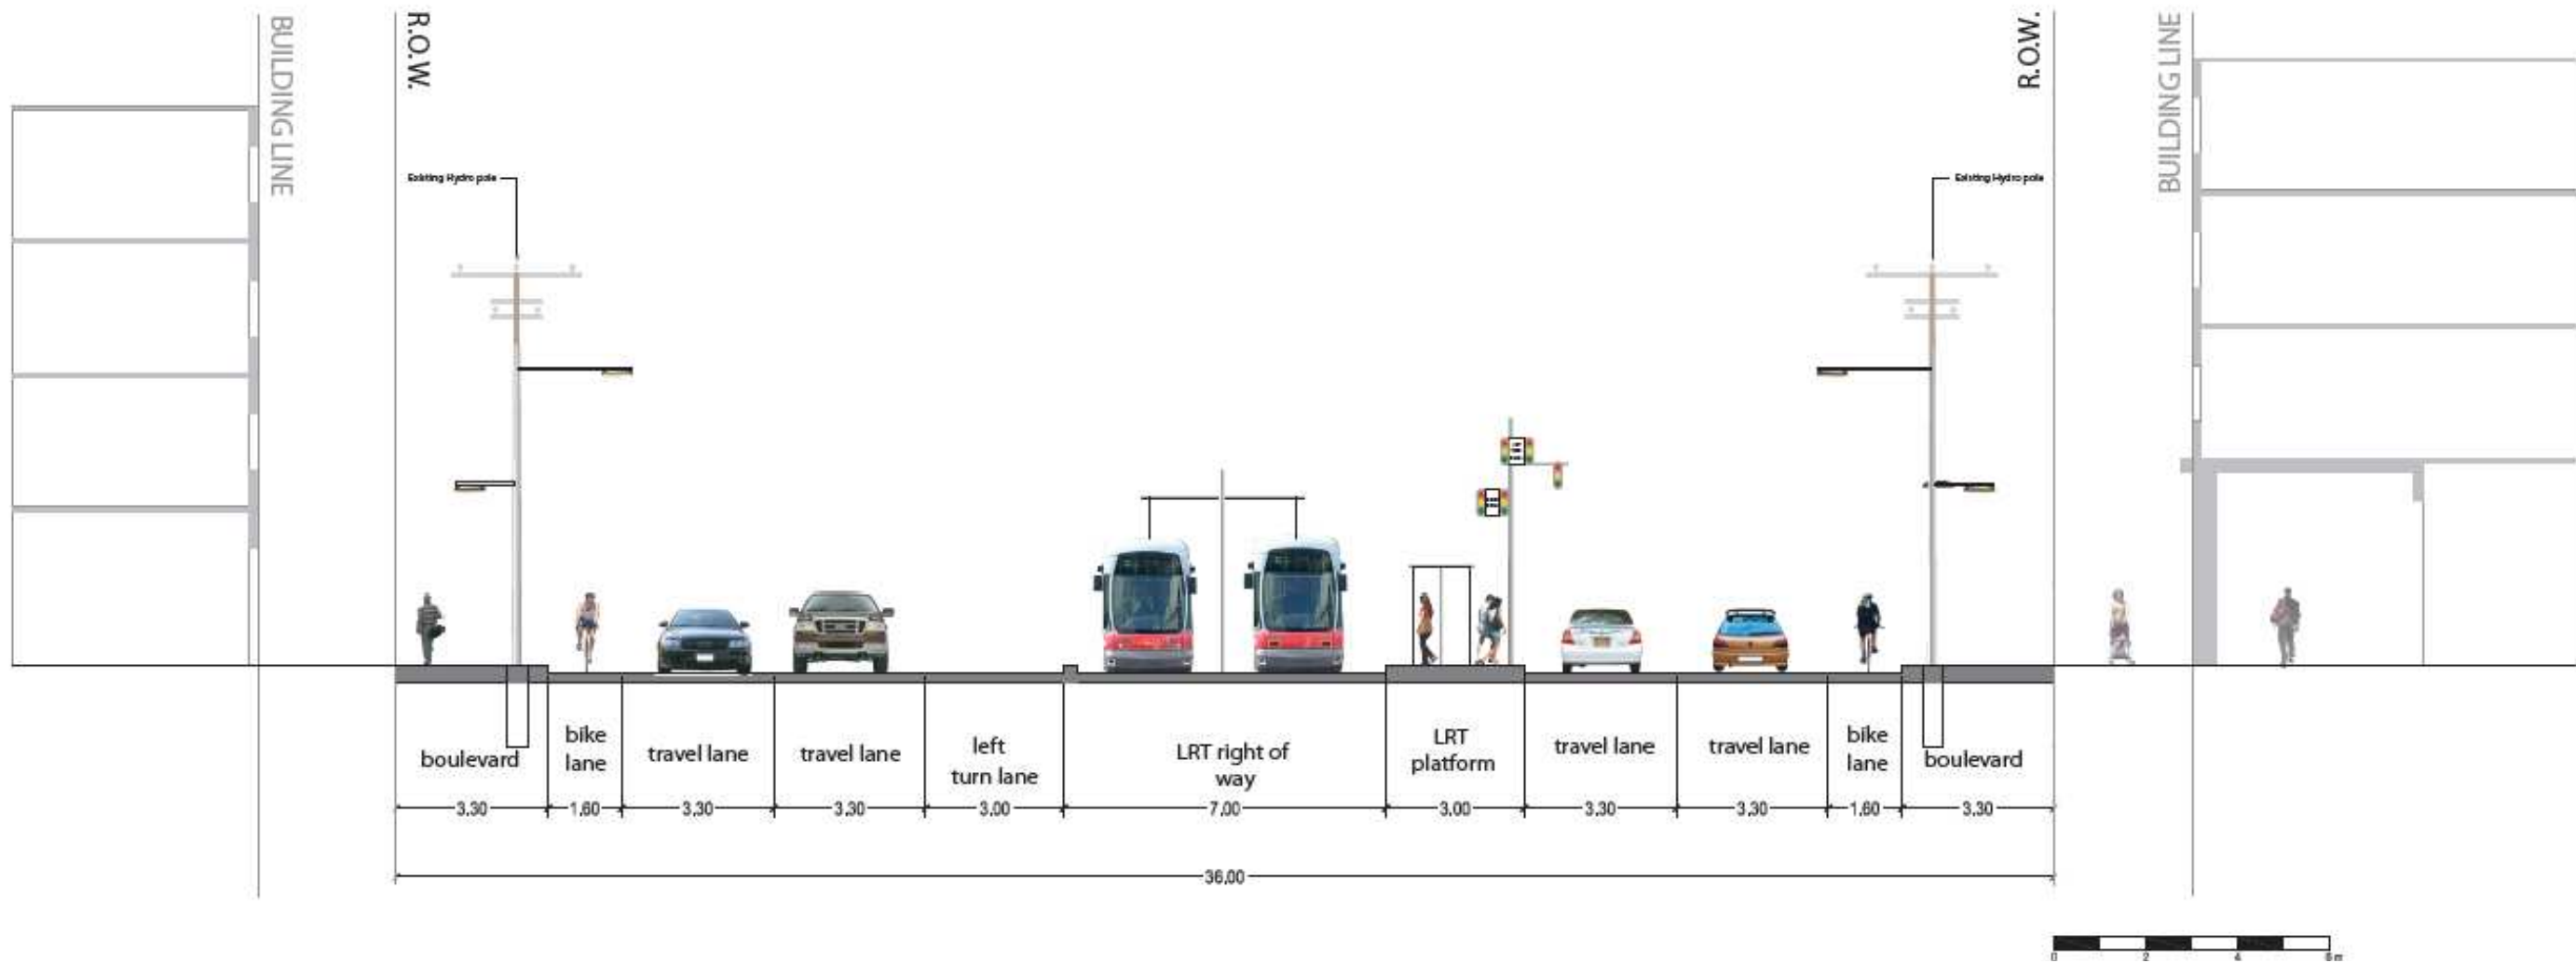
Proposed Sheppard LRT Cross-Section (at Urban Intersections)
